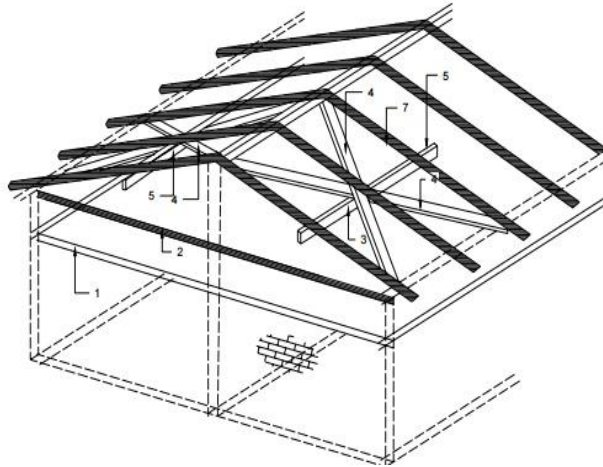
Diagonal bracing of joist and rafters. *Adapted from Guidelines for Earthquake Resistant Buildings, Department of Urban Development and Building Construction, Nepal, 1994
